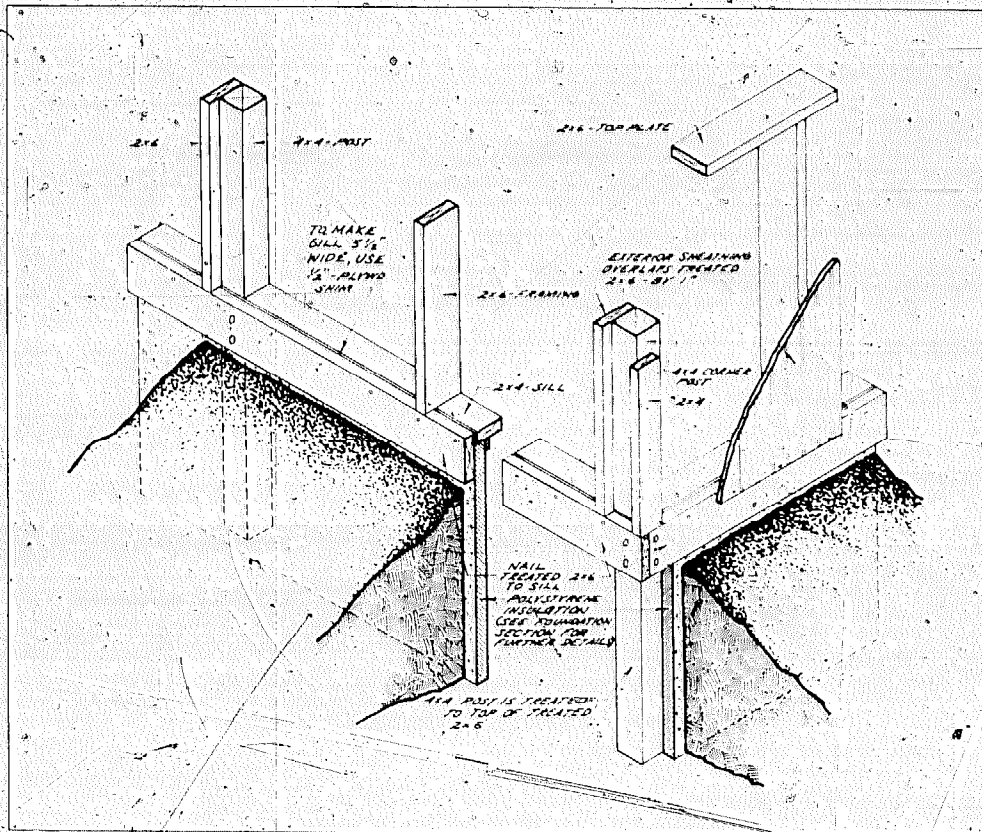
Framing of 2×6 solid wall on 4×4 post foundation (posts 8'0" on center)
